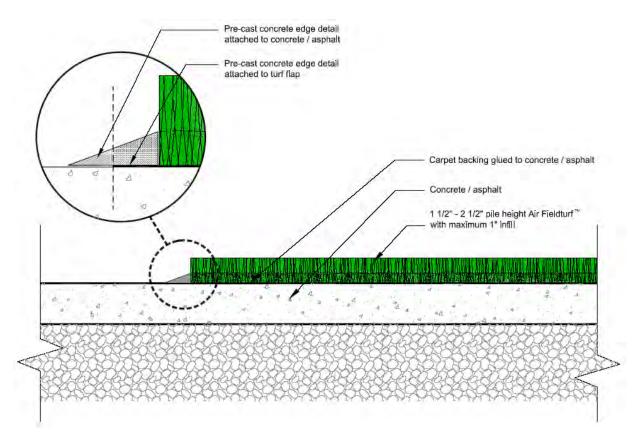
PRECAST CONCRETE EDGE DETAIL FOR INSTALLATION ON CONCRETE AND ASPHALT
